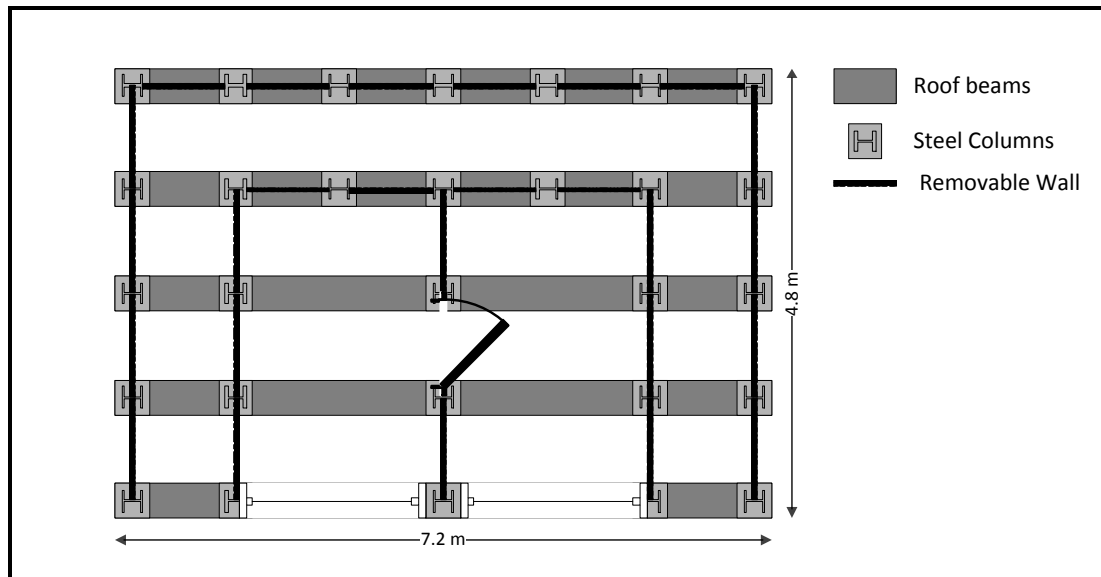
Structural design of the FRS explosion chamber (Rig A)
